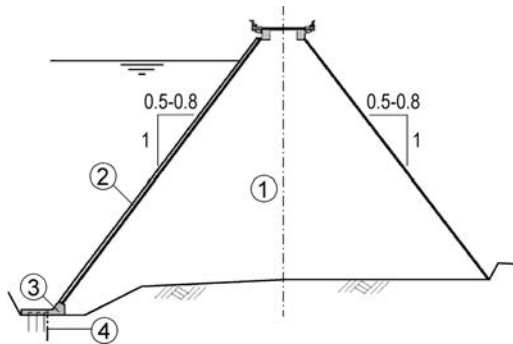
Cross-section of a typical hardfill dam. (1) Hardfill; (2) waterproof facing; (3) plinth; (4) grout curtain.
